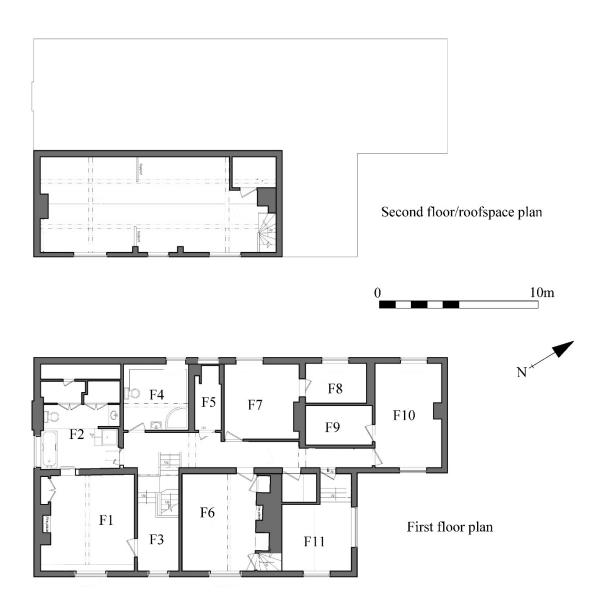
Existing first and second floor plans Modified from plan supplied by Staniforth Architects
